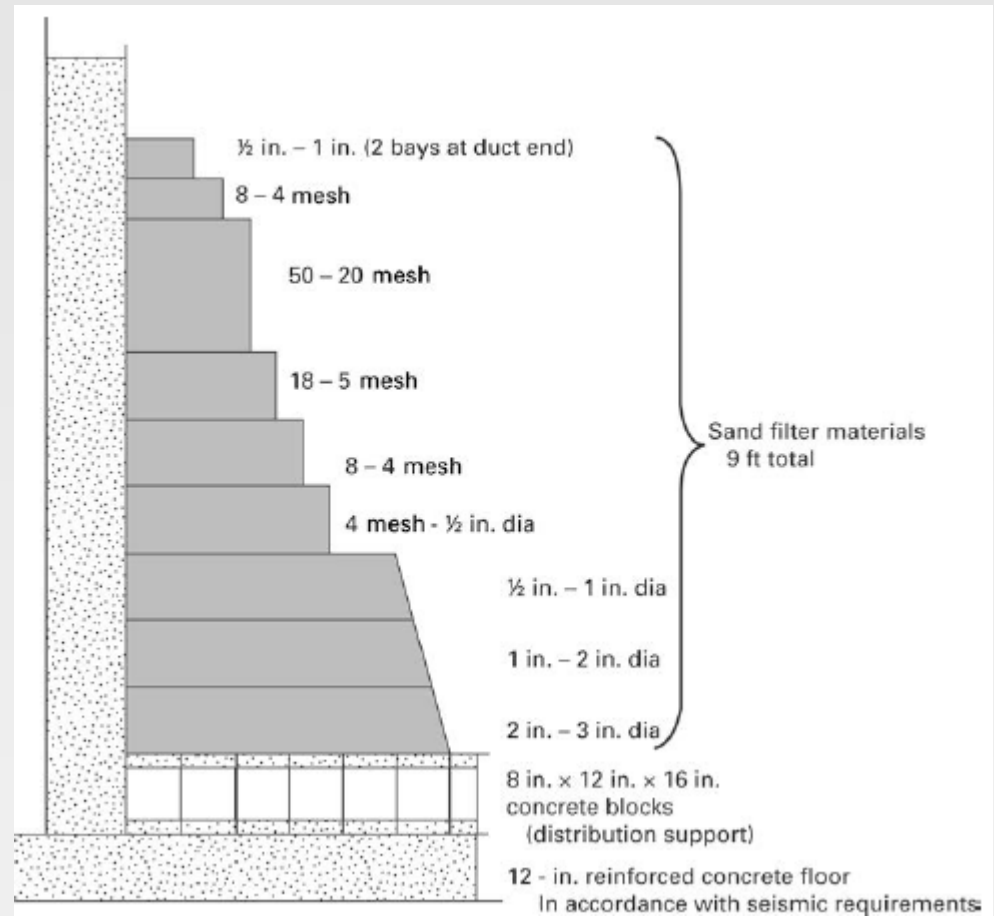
from DOE-HDBK-1169-2022 - Section through Typical Sand Filter
